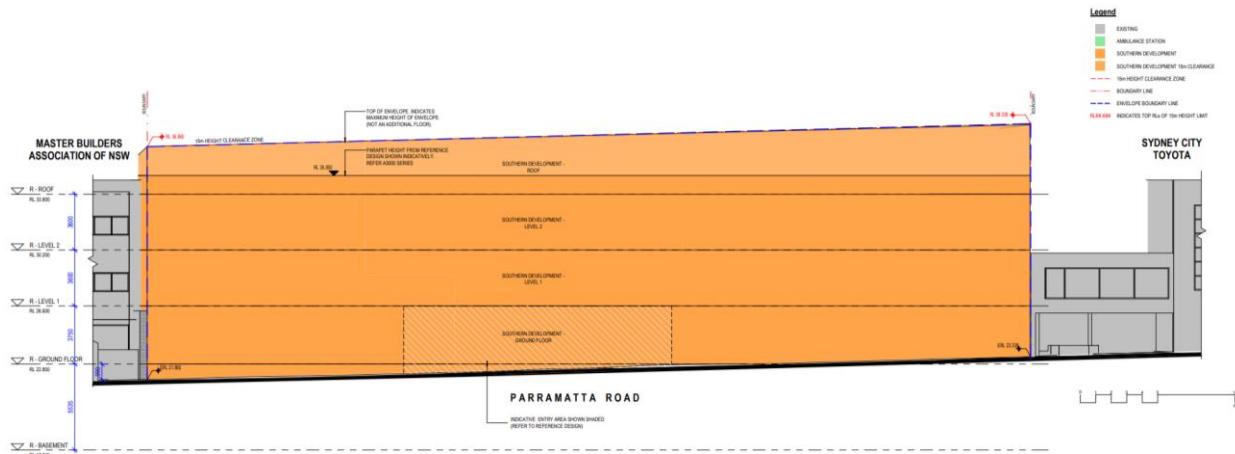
Southern Elevation of Reference Design and Envelope to Parramatta Road (Architectus)
